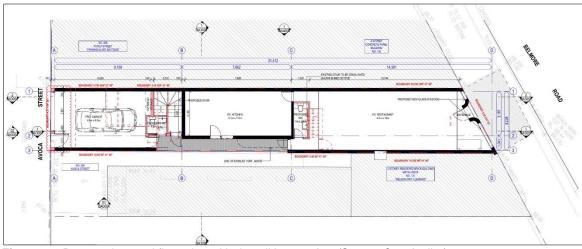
Proposed ground floor plan with demolition overlay (Square One Atelier)
